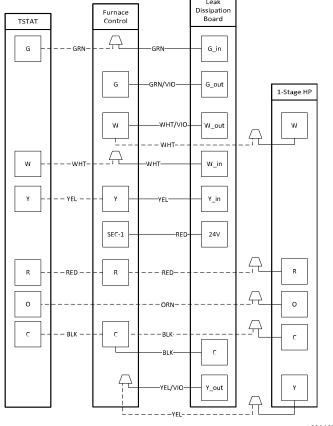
Wiring Layout, 1-Stage Heat Pump Unit
